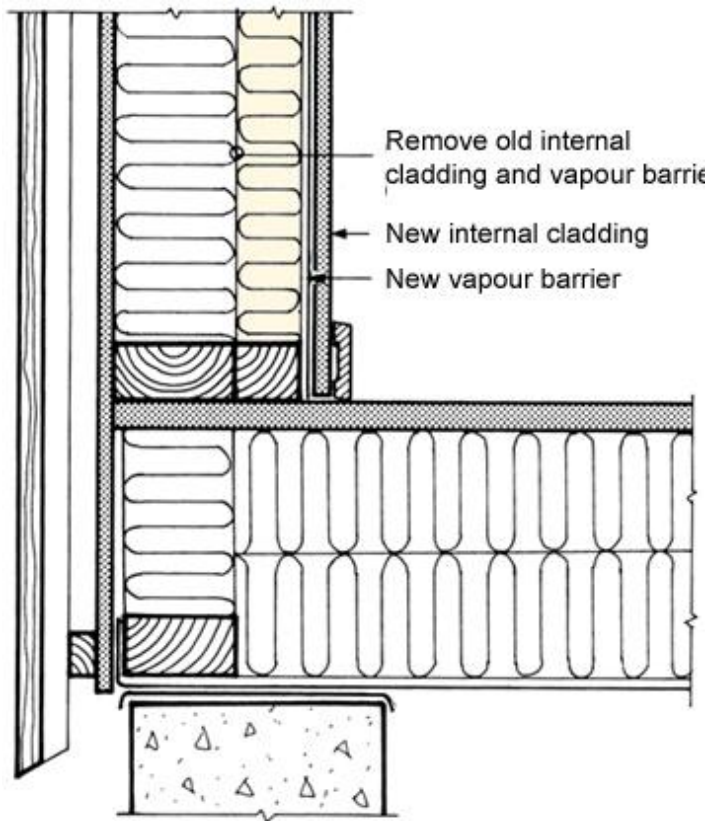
Internal insulation (light yellow) added to a timber framed wall with ventilated cladding (Hole 2004).
